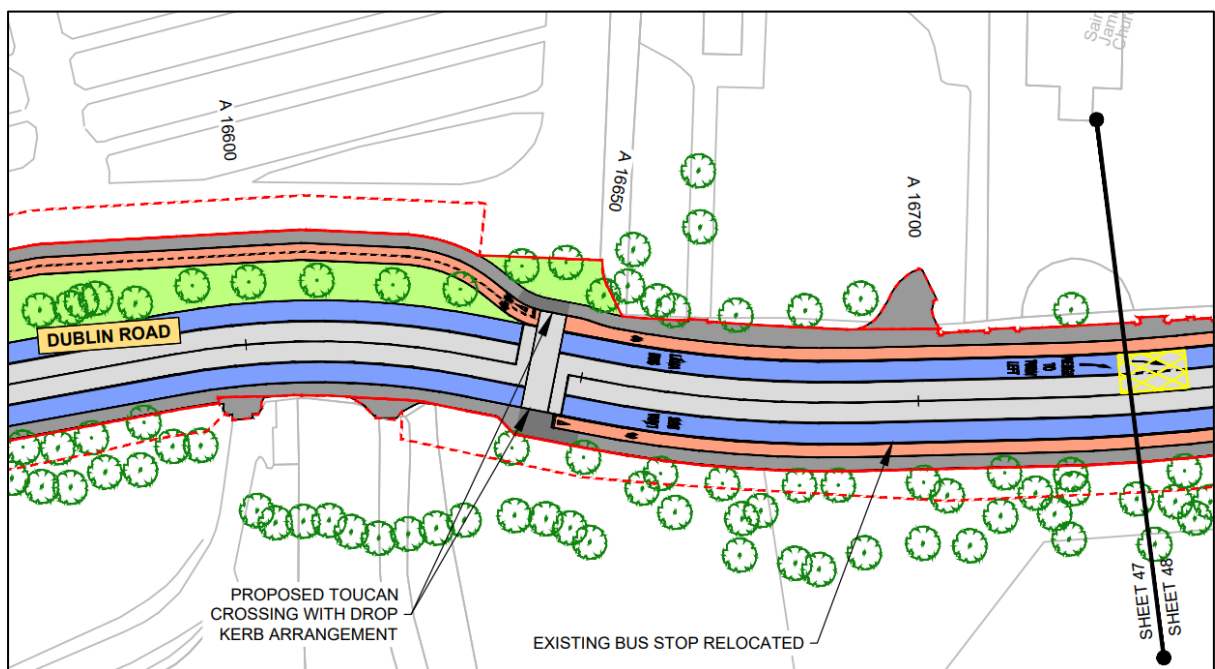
Extract from General Arrangement Drawings at Beauchamp House (Sheet 47)
